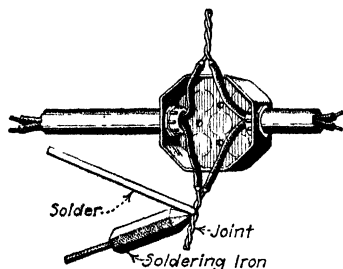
Soldering a joint with an "iron" or soldering copper.
